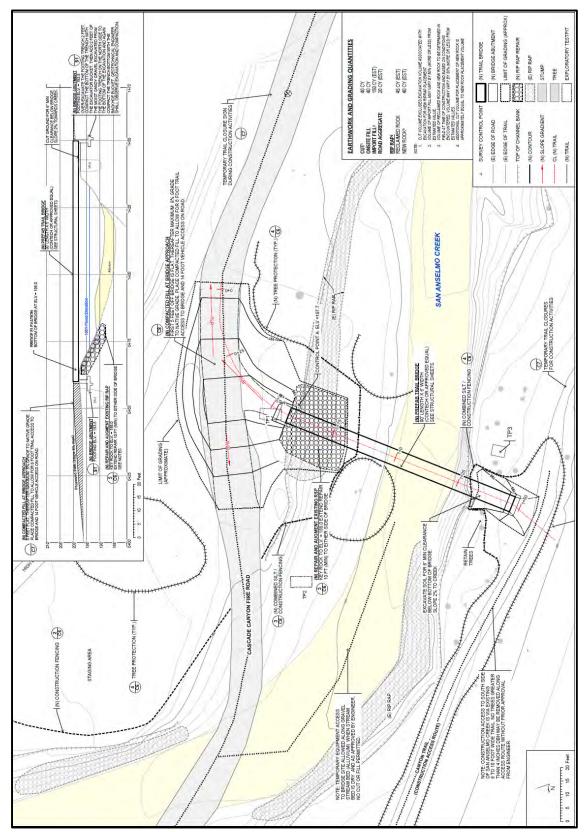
shows the Location of the Proposed Project Elements in Plan View.
